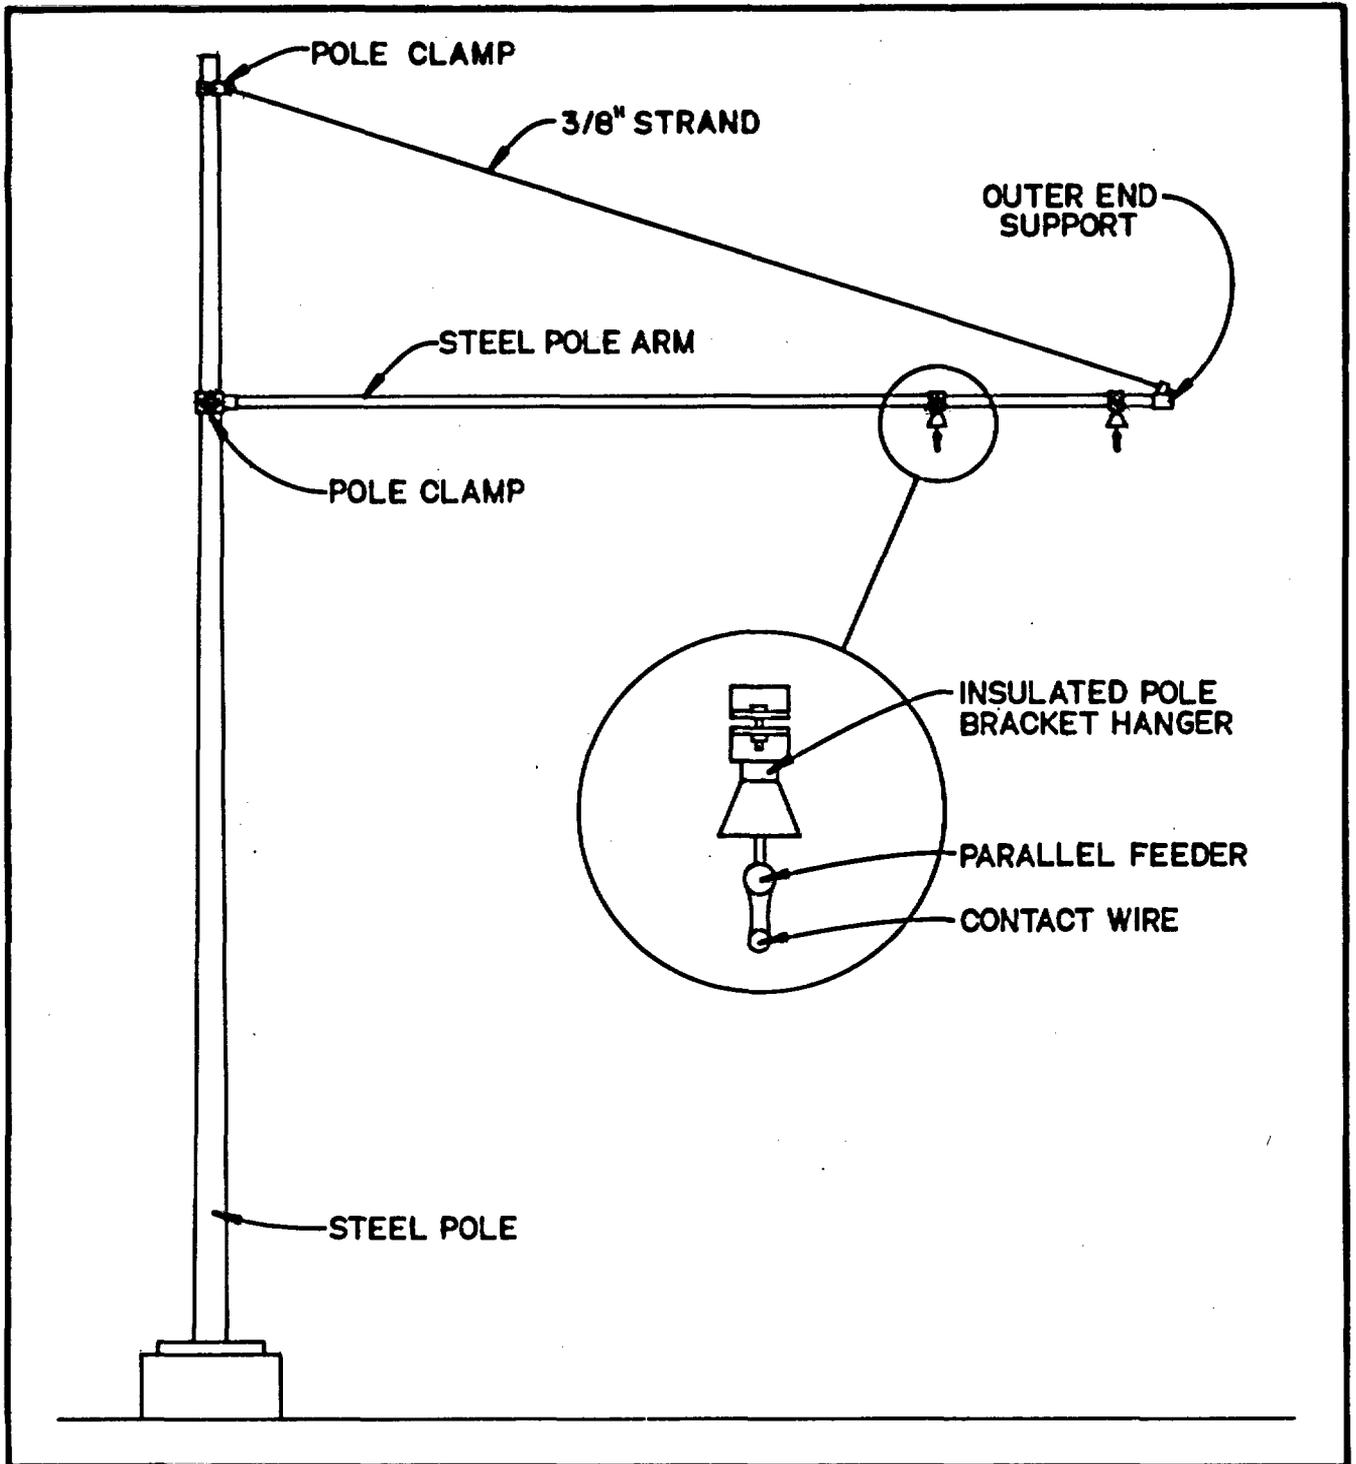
SURFACE CONTACT WIRE SUPPORT
